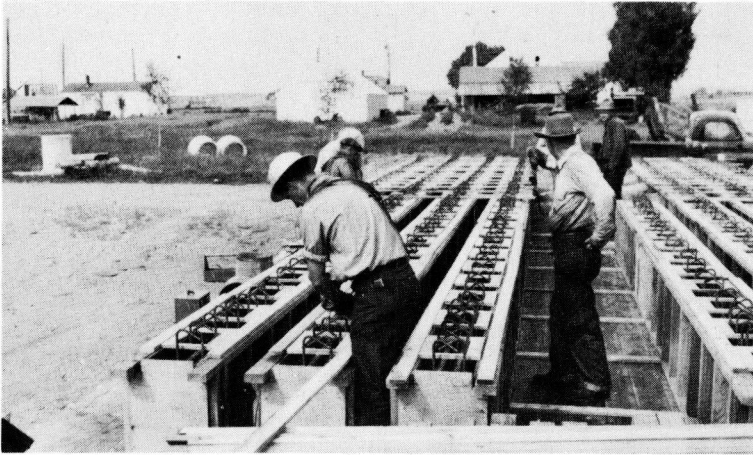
Baker River Bridge - Forms for Stringers About Ready for Placing of Concrete
